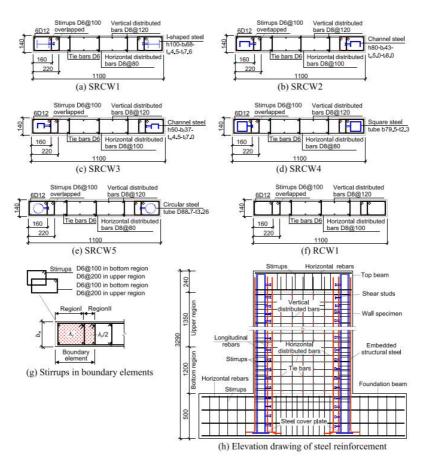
Details of wall specimens in Ji et al. (2015).
